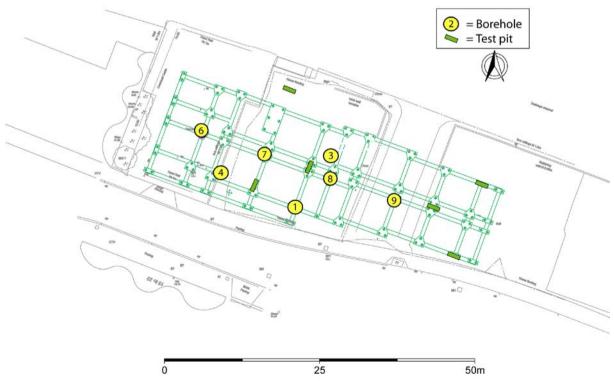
Boreholes and test pits overlain on modern site layout and foundation design
